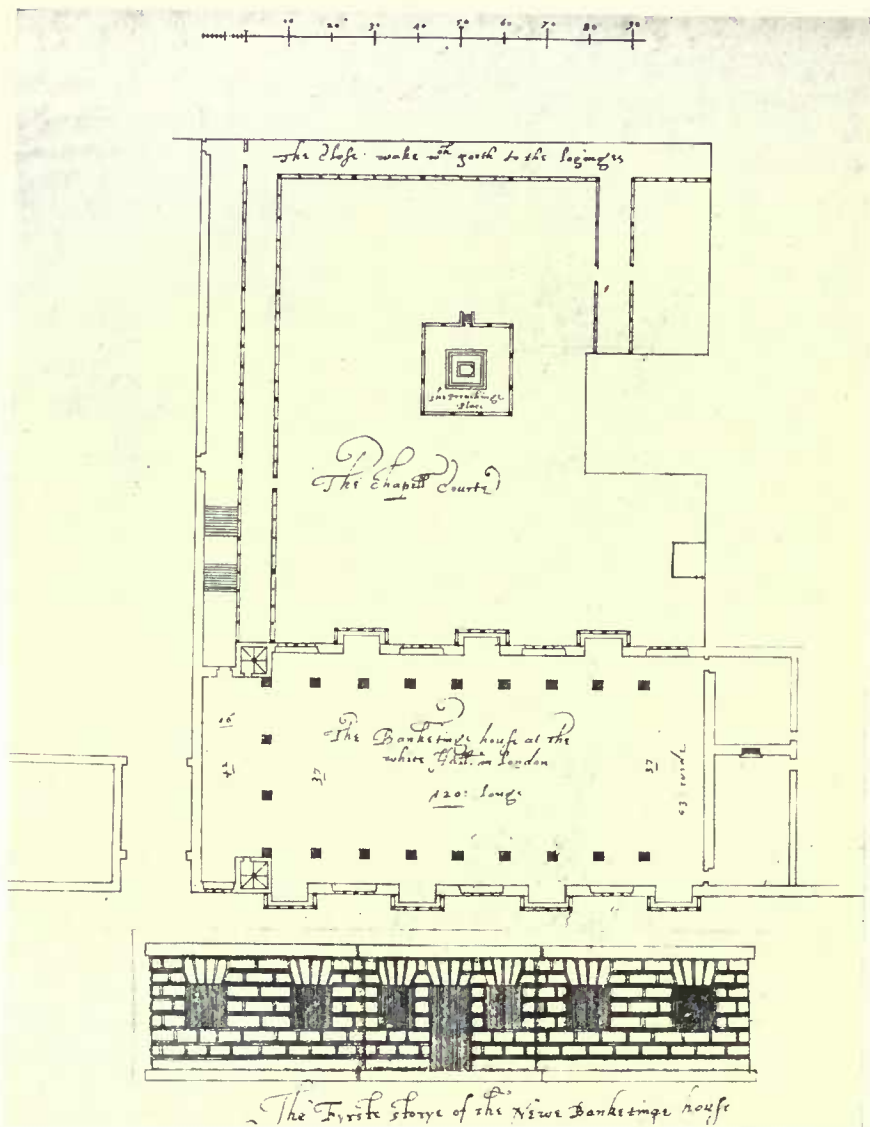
SMITHSON'S PLAN OF THE BANQUETING HOUSE OF 1607 (BURNT DOWN IN 1619) WHICH PRECEDED INIGO JONES'S
